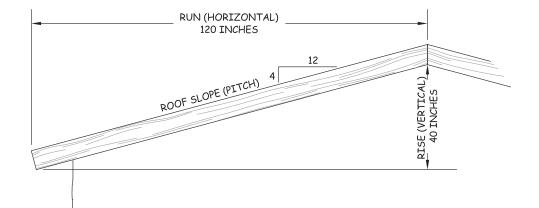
This drawing shows the relationship between the horizontal and vertical measurements of a roof and the pitch of the roof. After assembling the new roof materials and ensuring that the safety system is in place, remove the existing roof down to bare sheathing (see figures 210, 211, and 212). Shingle rippers, pry bars, flat-bladed shovels, roofing spuds, roofing shovels, and hammers are useful for removing shingles and shakes (see figures 57, 59, and 232). If the cabin doesn't have sheathing, remove everything down to the purlins. Remove all the nails and other fasteners. By the time you need to replace roofing, the flashing usually is pretty beat up, too, so remove that as well. See the Flashing section of this guide for more information.
